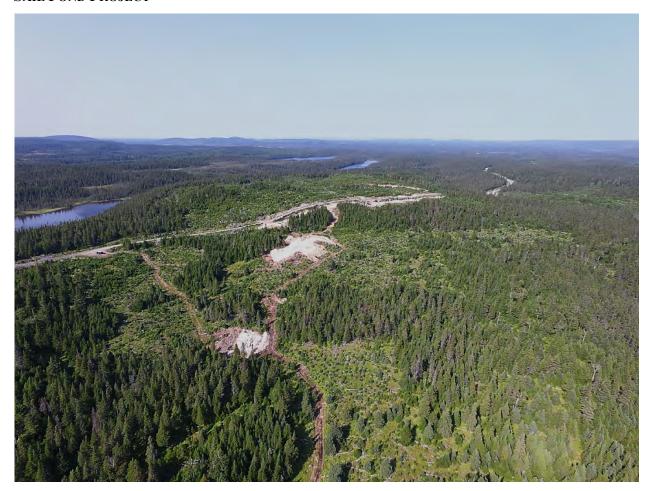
Sail Pond Project Area Access Road and Trenching at Heimdall Zone, looking towards the north
